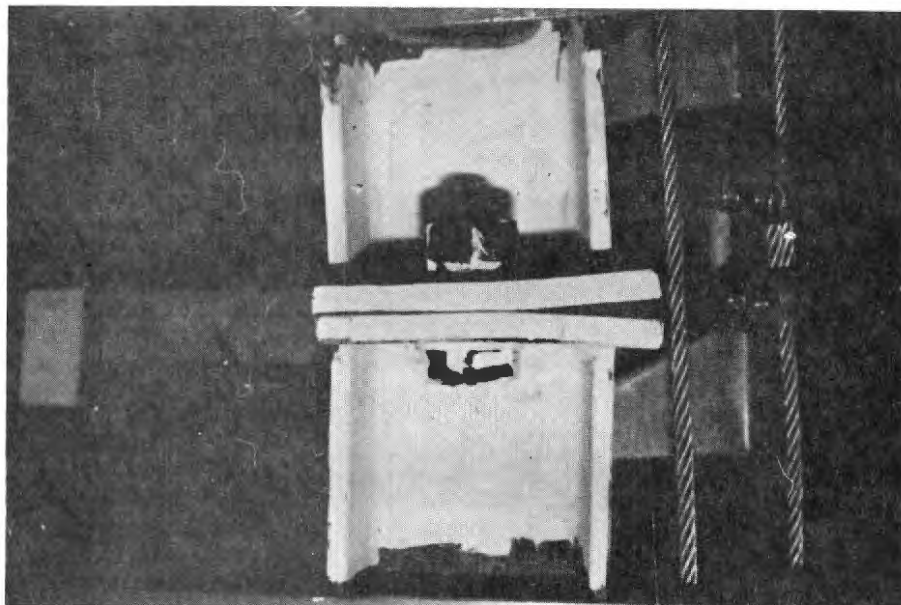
STANDARD CONNECTION AFTER FAILURE
